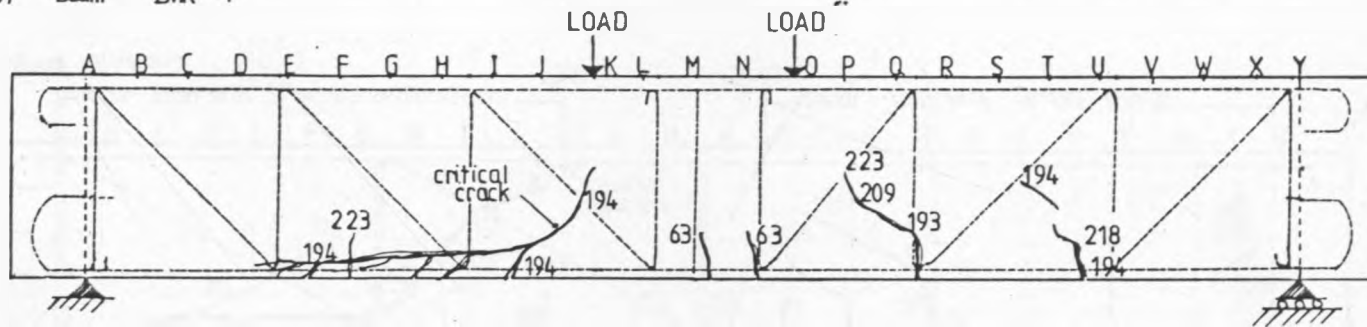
CRACK PATTERN FOR TYPE I BEAMS
